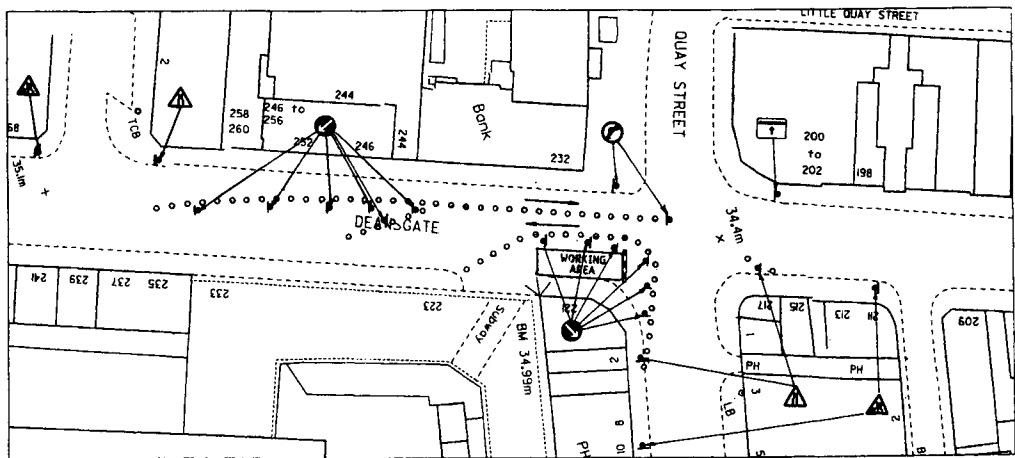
Signing of roadworks, Deansgate, Manchester.
